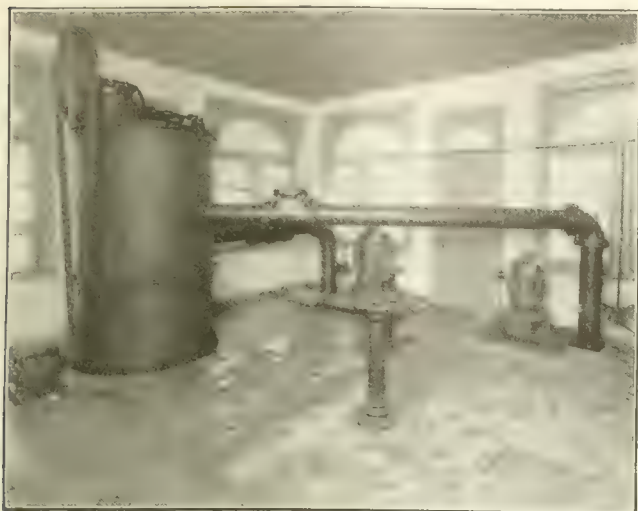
DOSING TANK AND TOP FLOOR OF PUMP HOUSE
